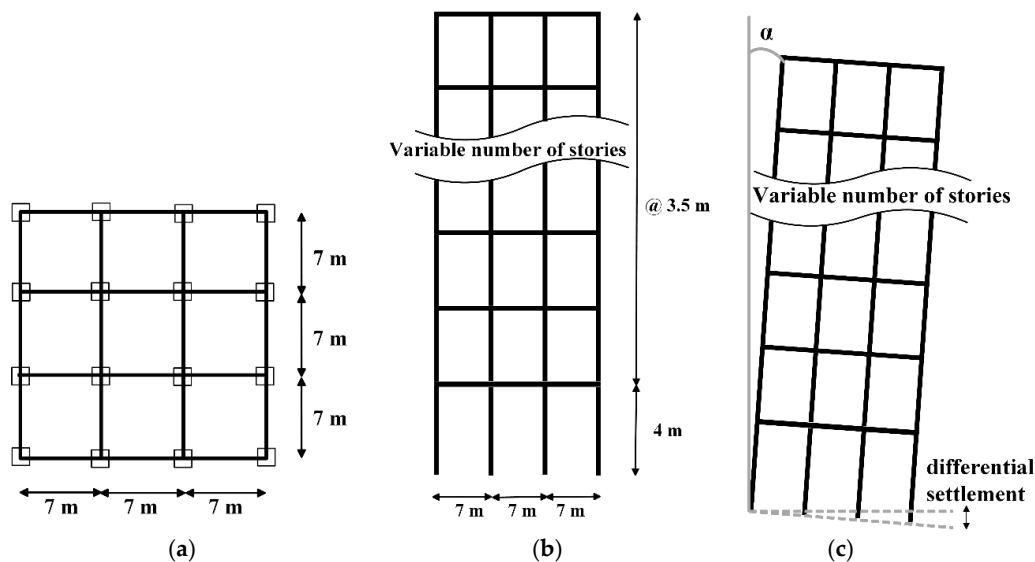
Plan, elevation, and characterization of asymmetric yielding of the buildings. (a) plan; (b) elevation; (c) asymmetric yielding building.
